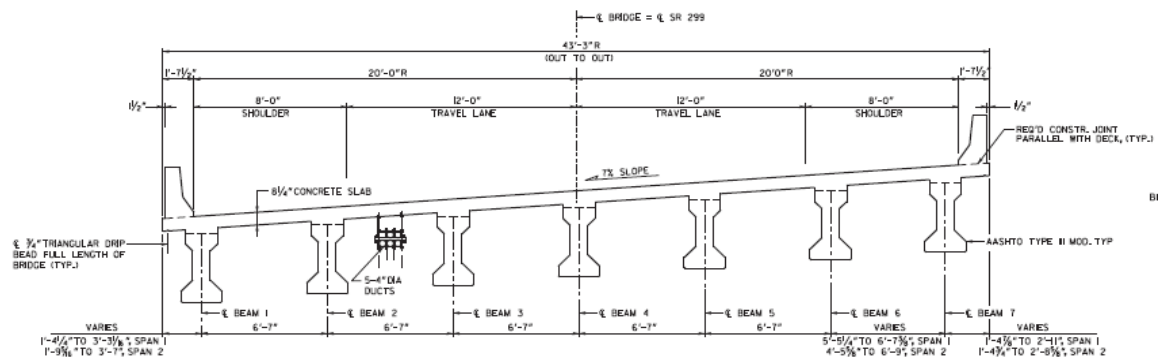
Section view of the SR299 bridge superstructure (GDOT-DRW, 2016).
